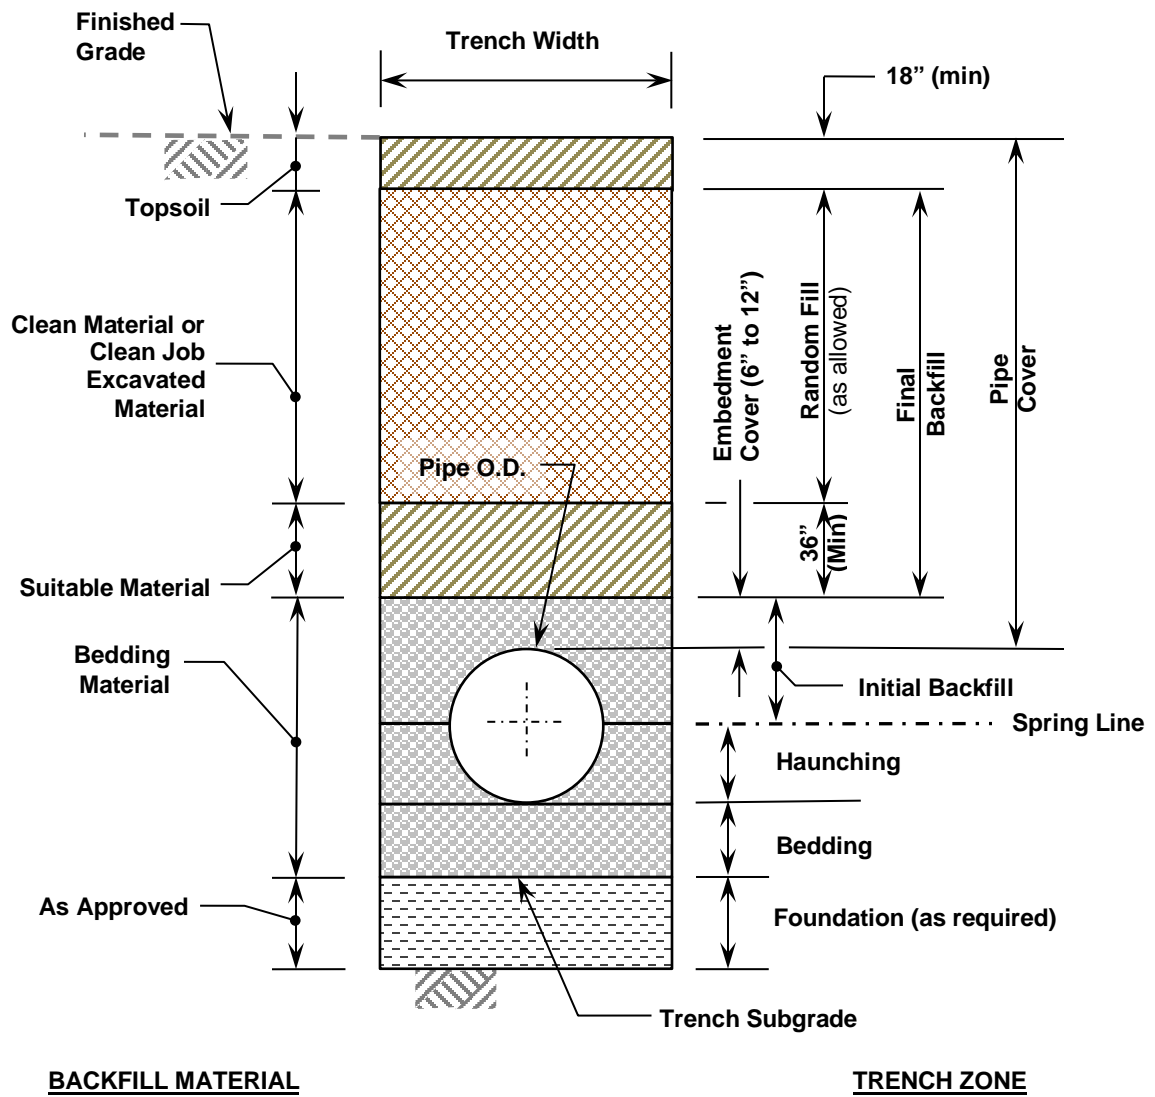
Trench Detail, Class A Bedding, Unpaved Areas
